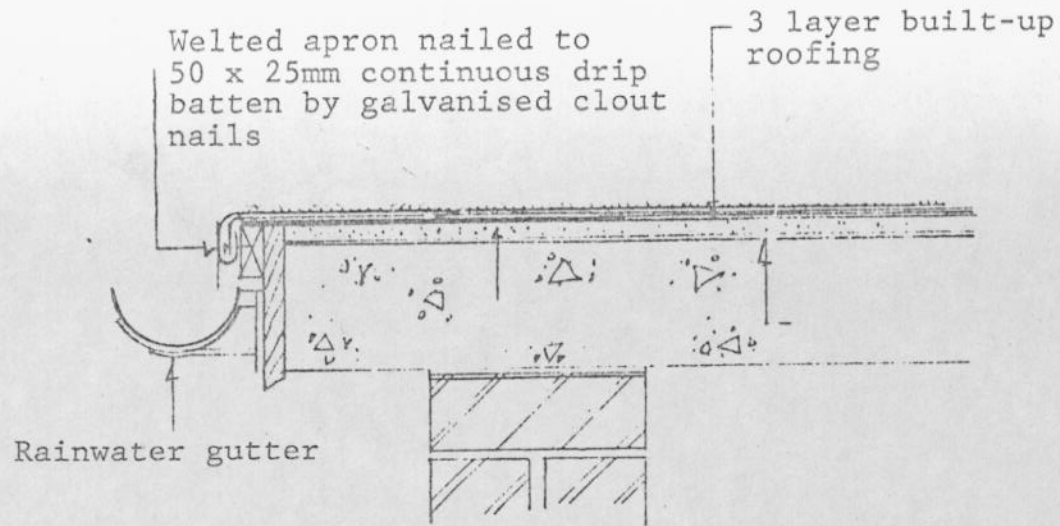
BUILT-UP FELT ROOFING: WELTED APRON TO EAVES
